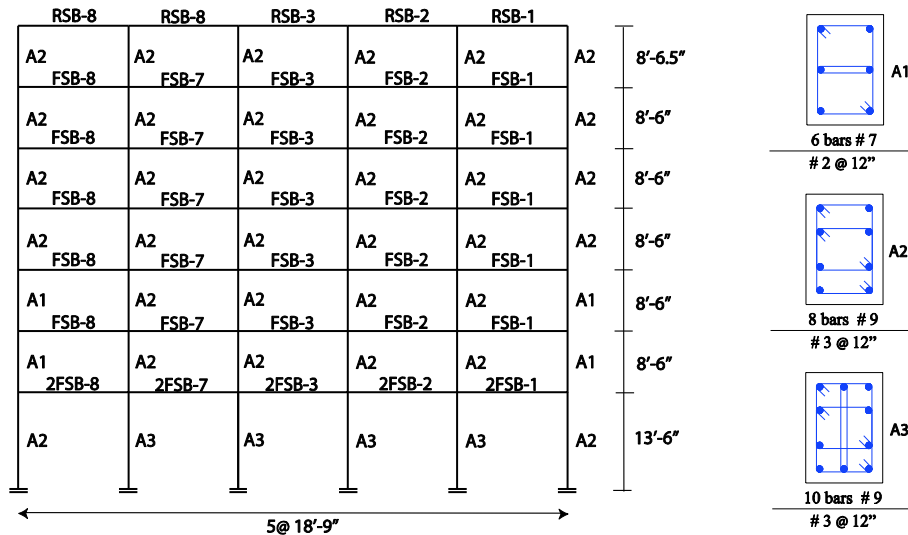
Schematic view of the frame with element number and column rebar arrangement
